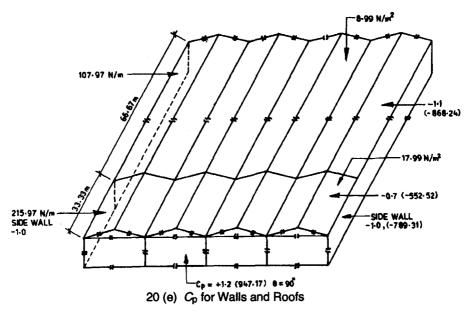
A BUILDING WITH MULTISPAN PITCHED ROOF (Continued)
